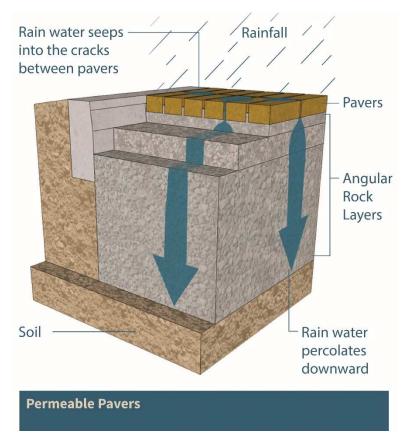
PERMEABLE PAVER SECTION DETAIL
